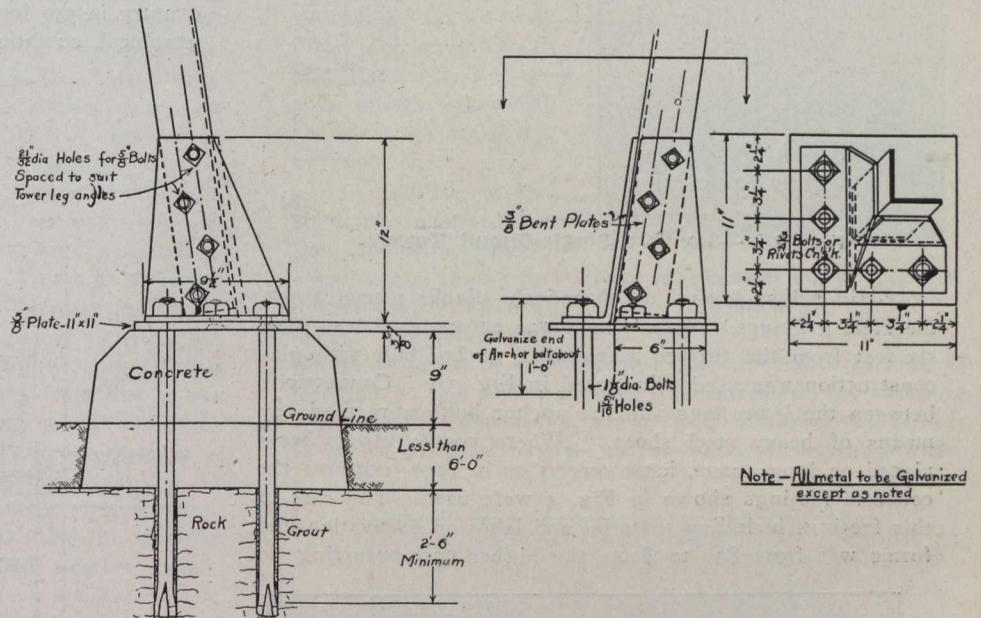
Tower Footing Where Rock Occurs Less Than 6 Ft. Below Earth Line.
